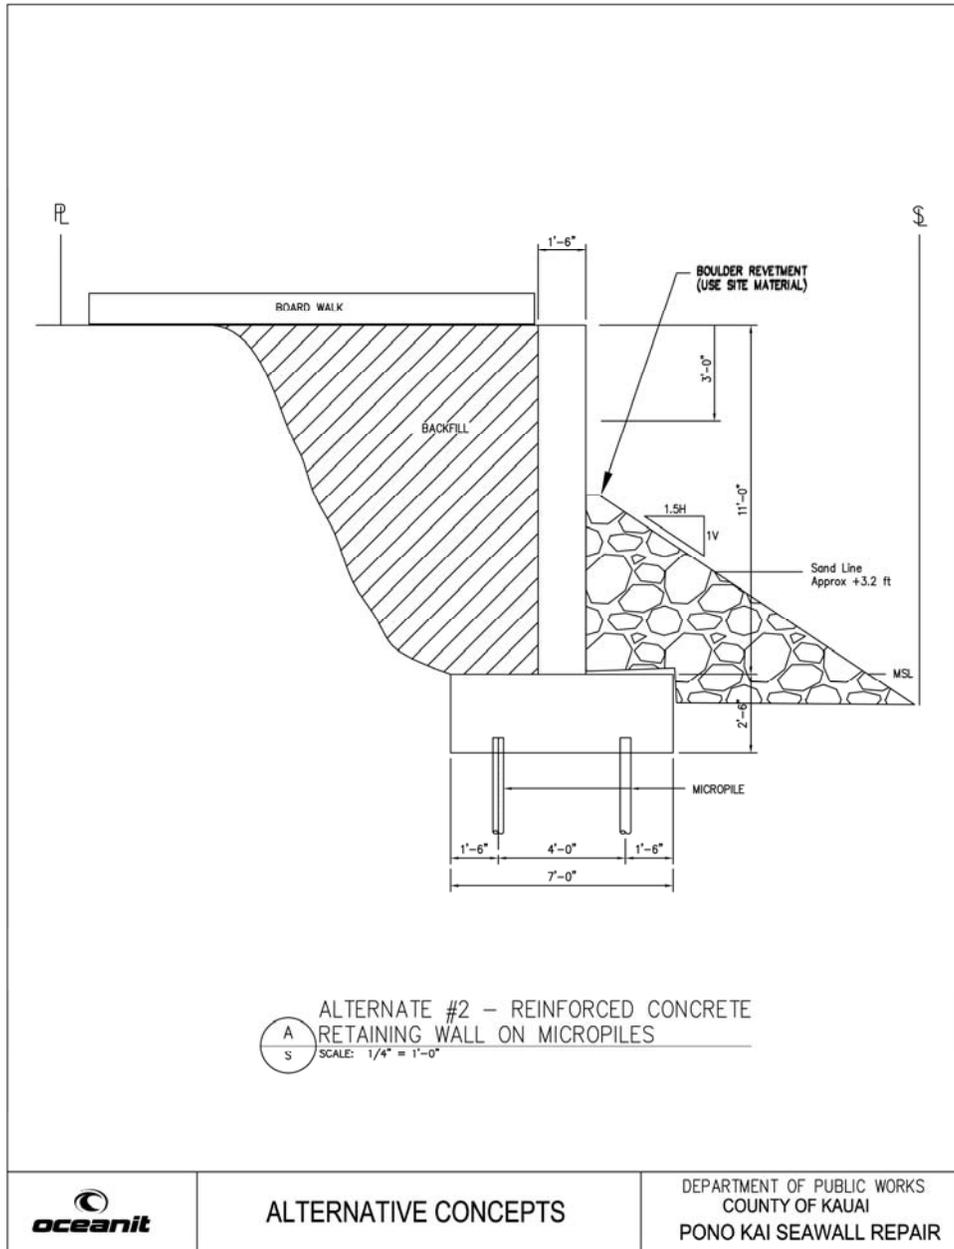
Reinforced Concrete Retaining Wall on Micropiles
